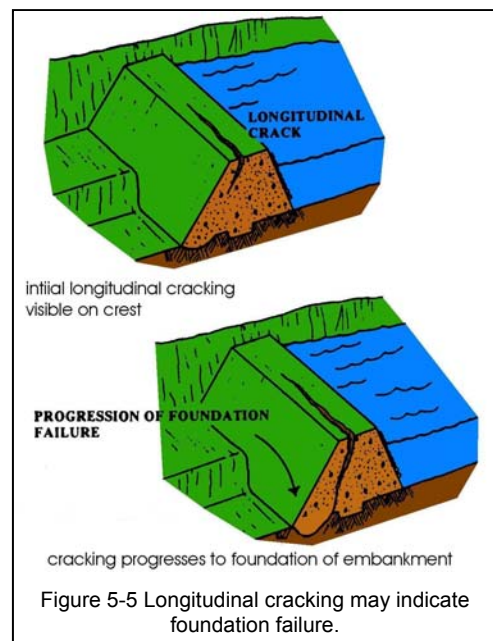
Longitudinal cracking may indicate foundation failure.
